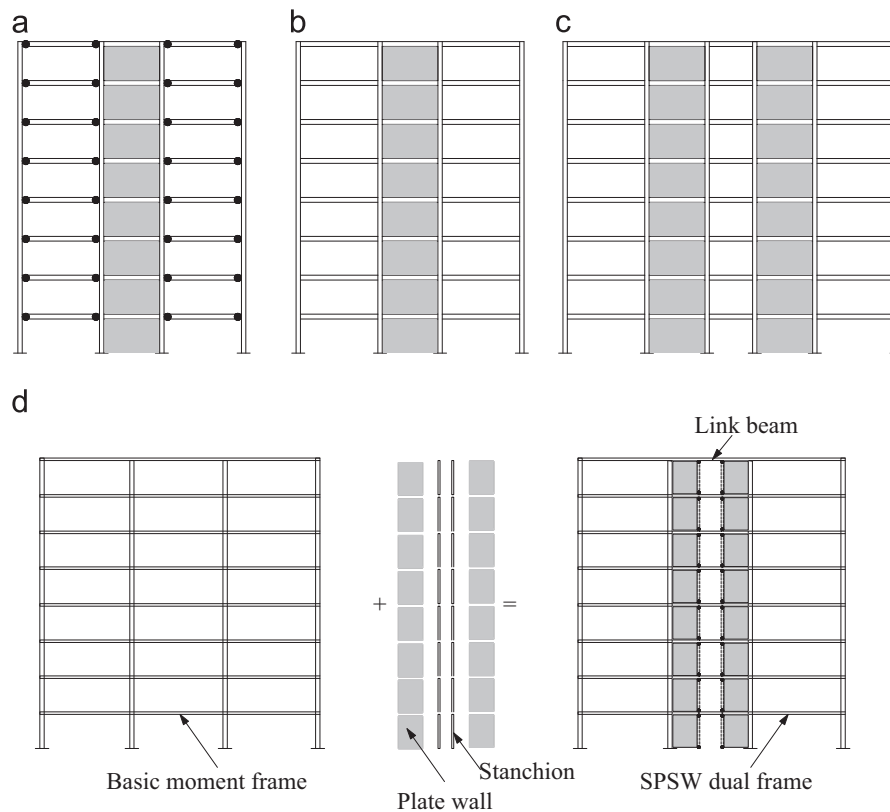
SPSW frame systems: (a) singular shear wall inside gravity frame; (b) dual system with shear wall and moment frames; (c) dual system with shear wall and coupling beams; (d) dual system with link beam.
